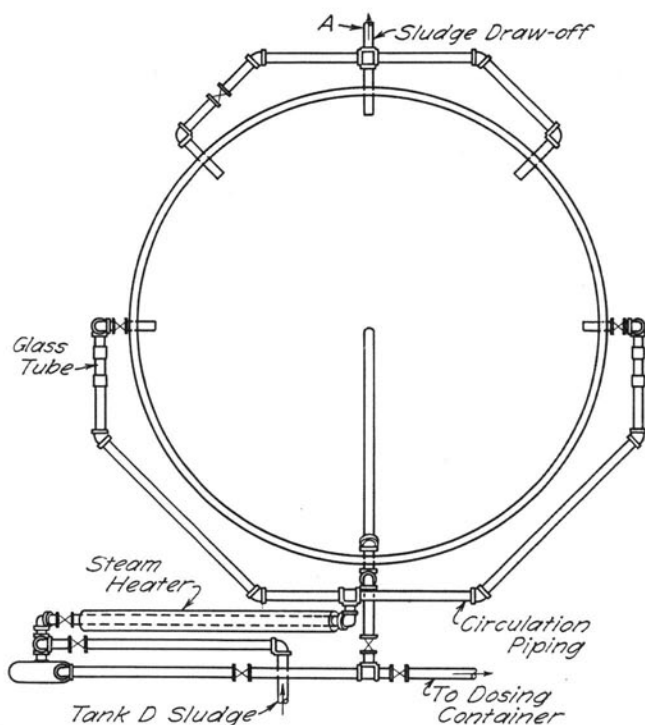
PLAN OF TANK C SHOWING PIPING ARRANGEMENT
